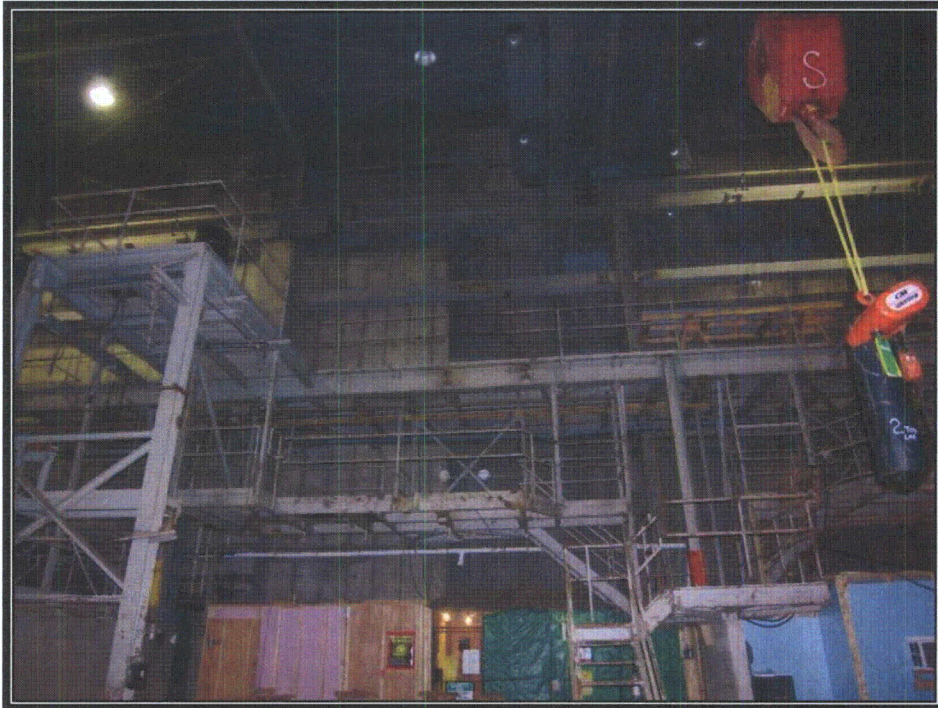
North wall of steam generator building showing service platform (Photograph by RCG&A, 2008)
